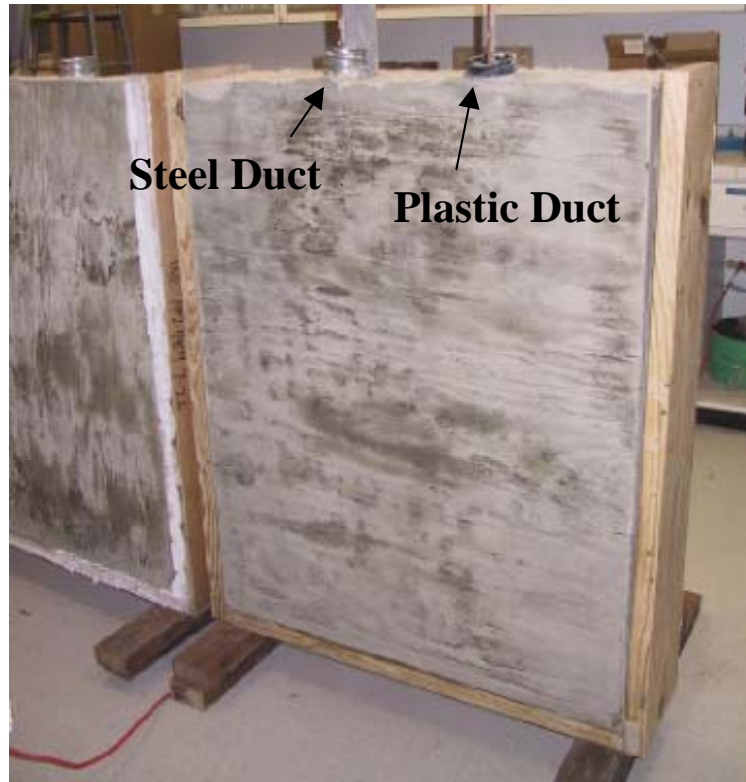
Two Concrete Walls with Steel and Plastic Ducts
